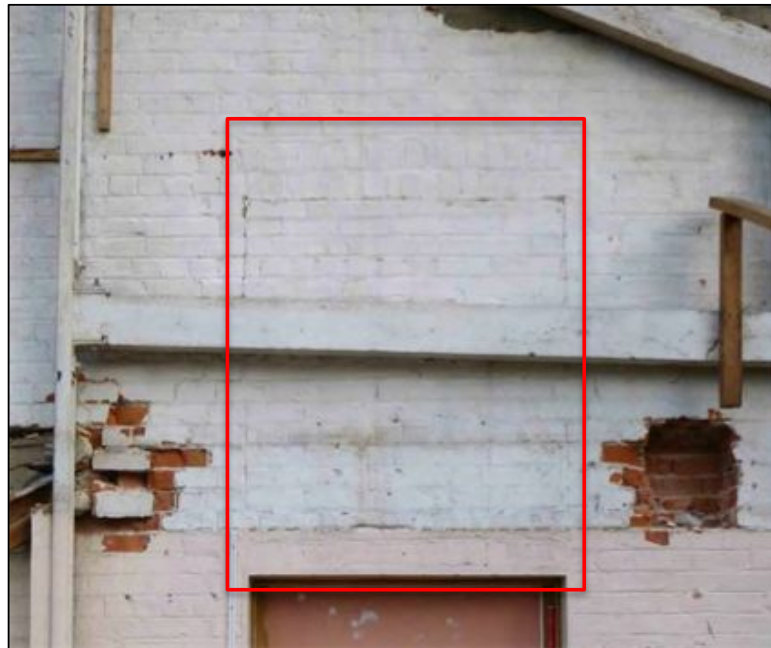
Photo of bricked up window and lintel above more recent doorway (photo facing south).
